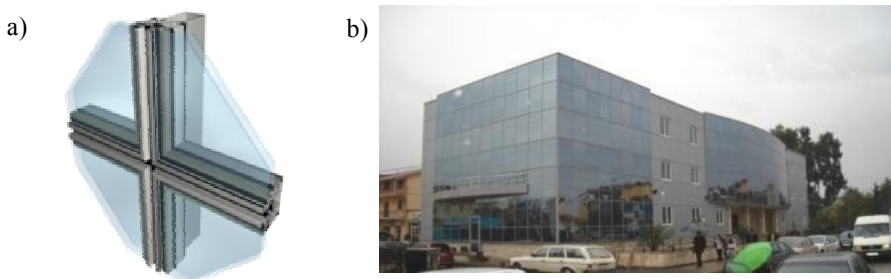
Semi Structural Solar Facade Serial ALUMIL M3
